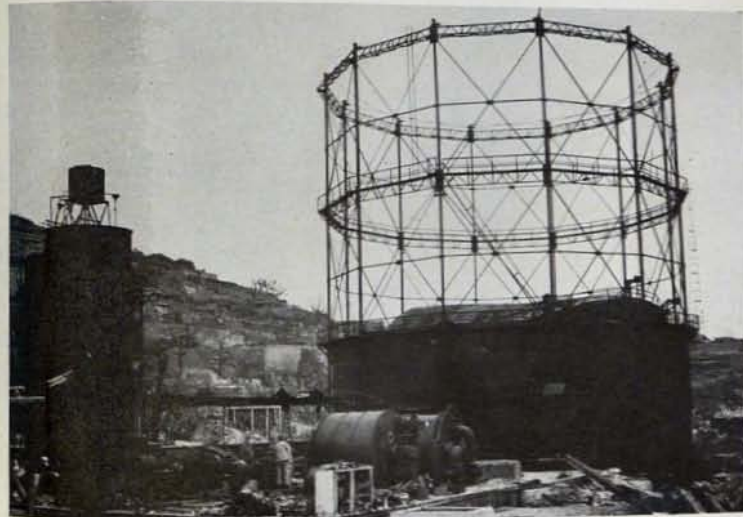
Group 41. Tank 4. Looking southeast showing crushed tank top.
